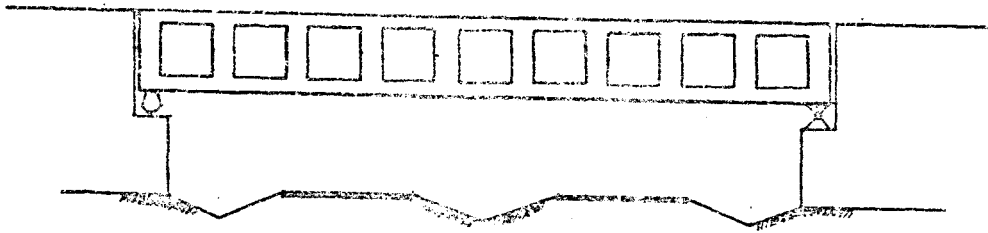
VIERENDEEL TRUSS BRIDGE CONCEPT
